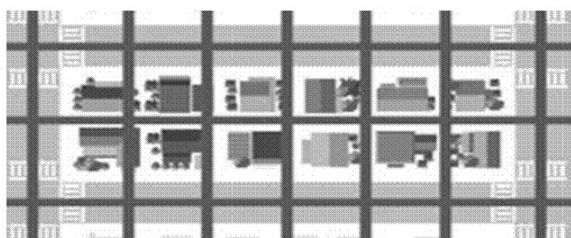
A plan for grid-wall soil improvement for roads and existing residential houses.
